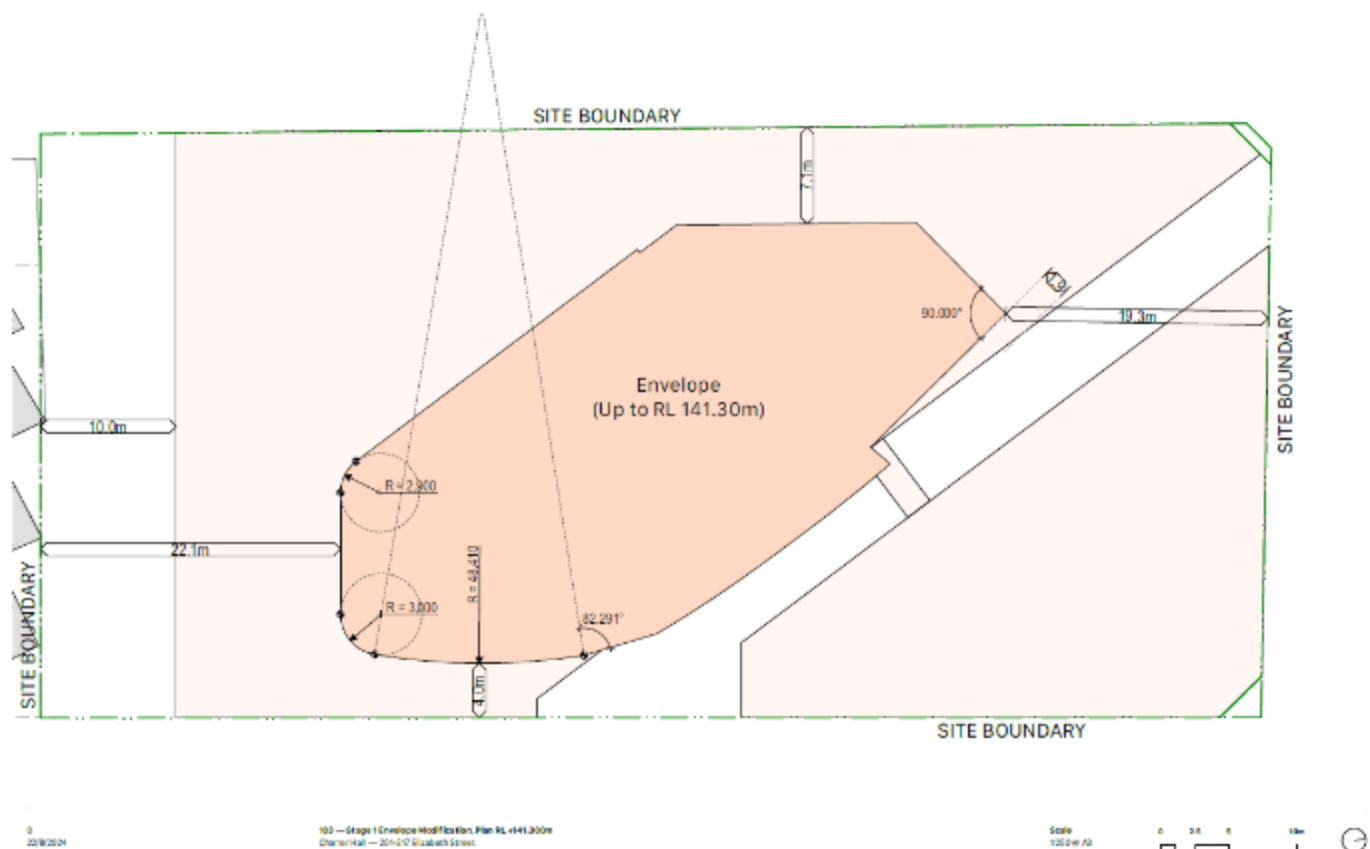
| Proposed low-rise tower (up to RL141.300) (Source: Ethos Urban modification plans)
